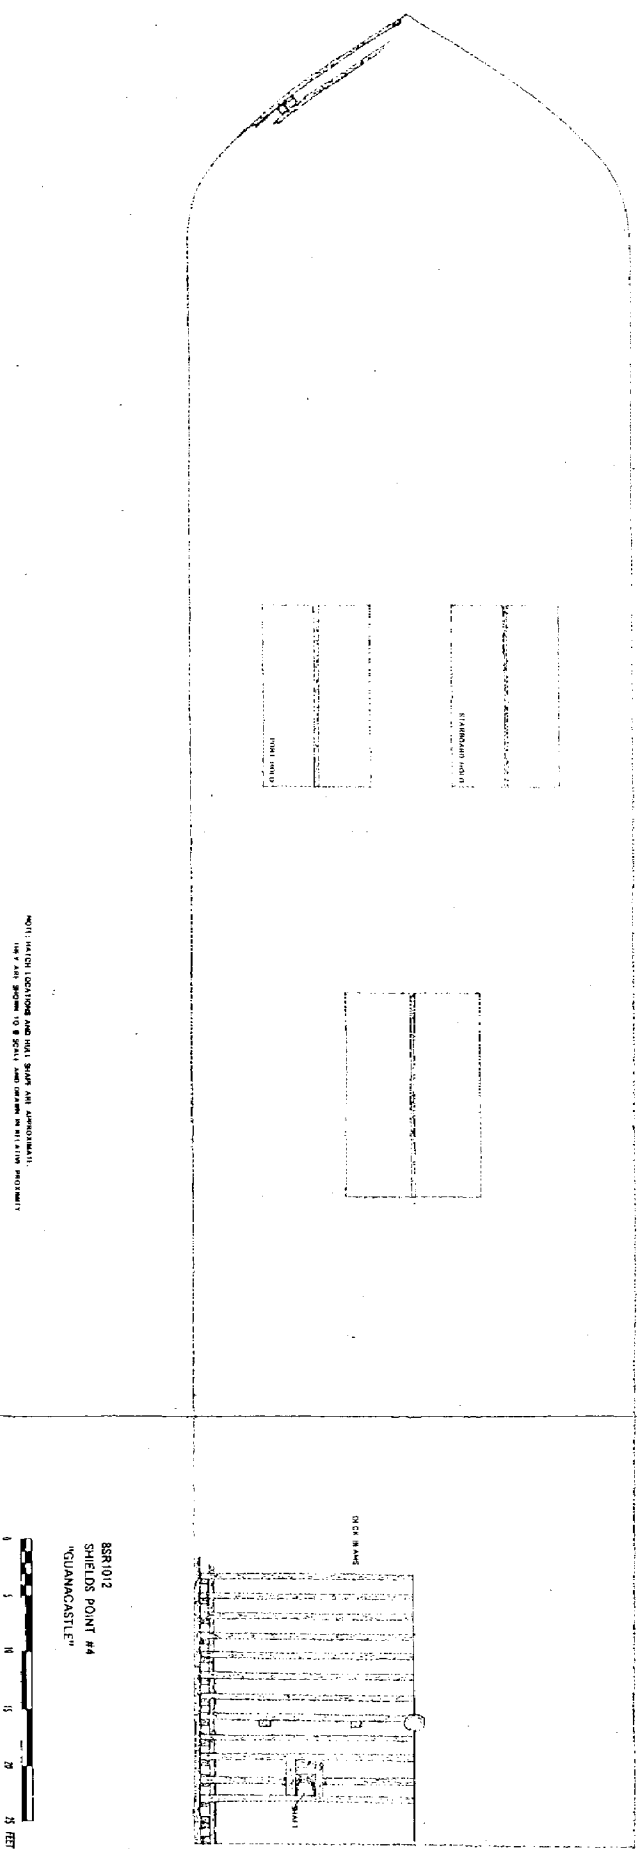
Site Plan of SSR1012, Shields Point # 4.
